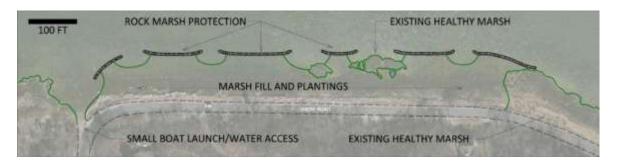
Conceptual planform diagram of a constructed marsh with segmented toe protection for shore road (FHWA 2016b).
